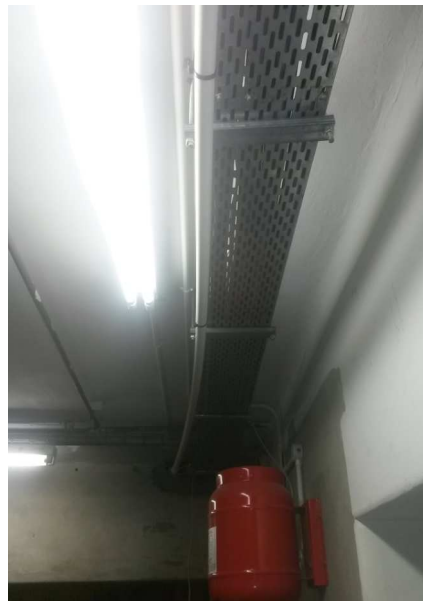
& 37: 4x Black PVC conduits entering the basement on the near left corner of the basement
